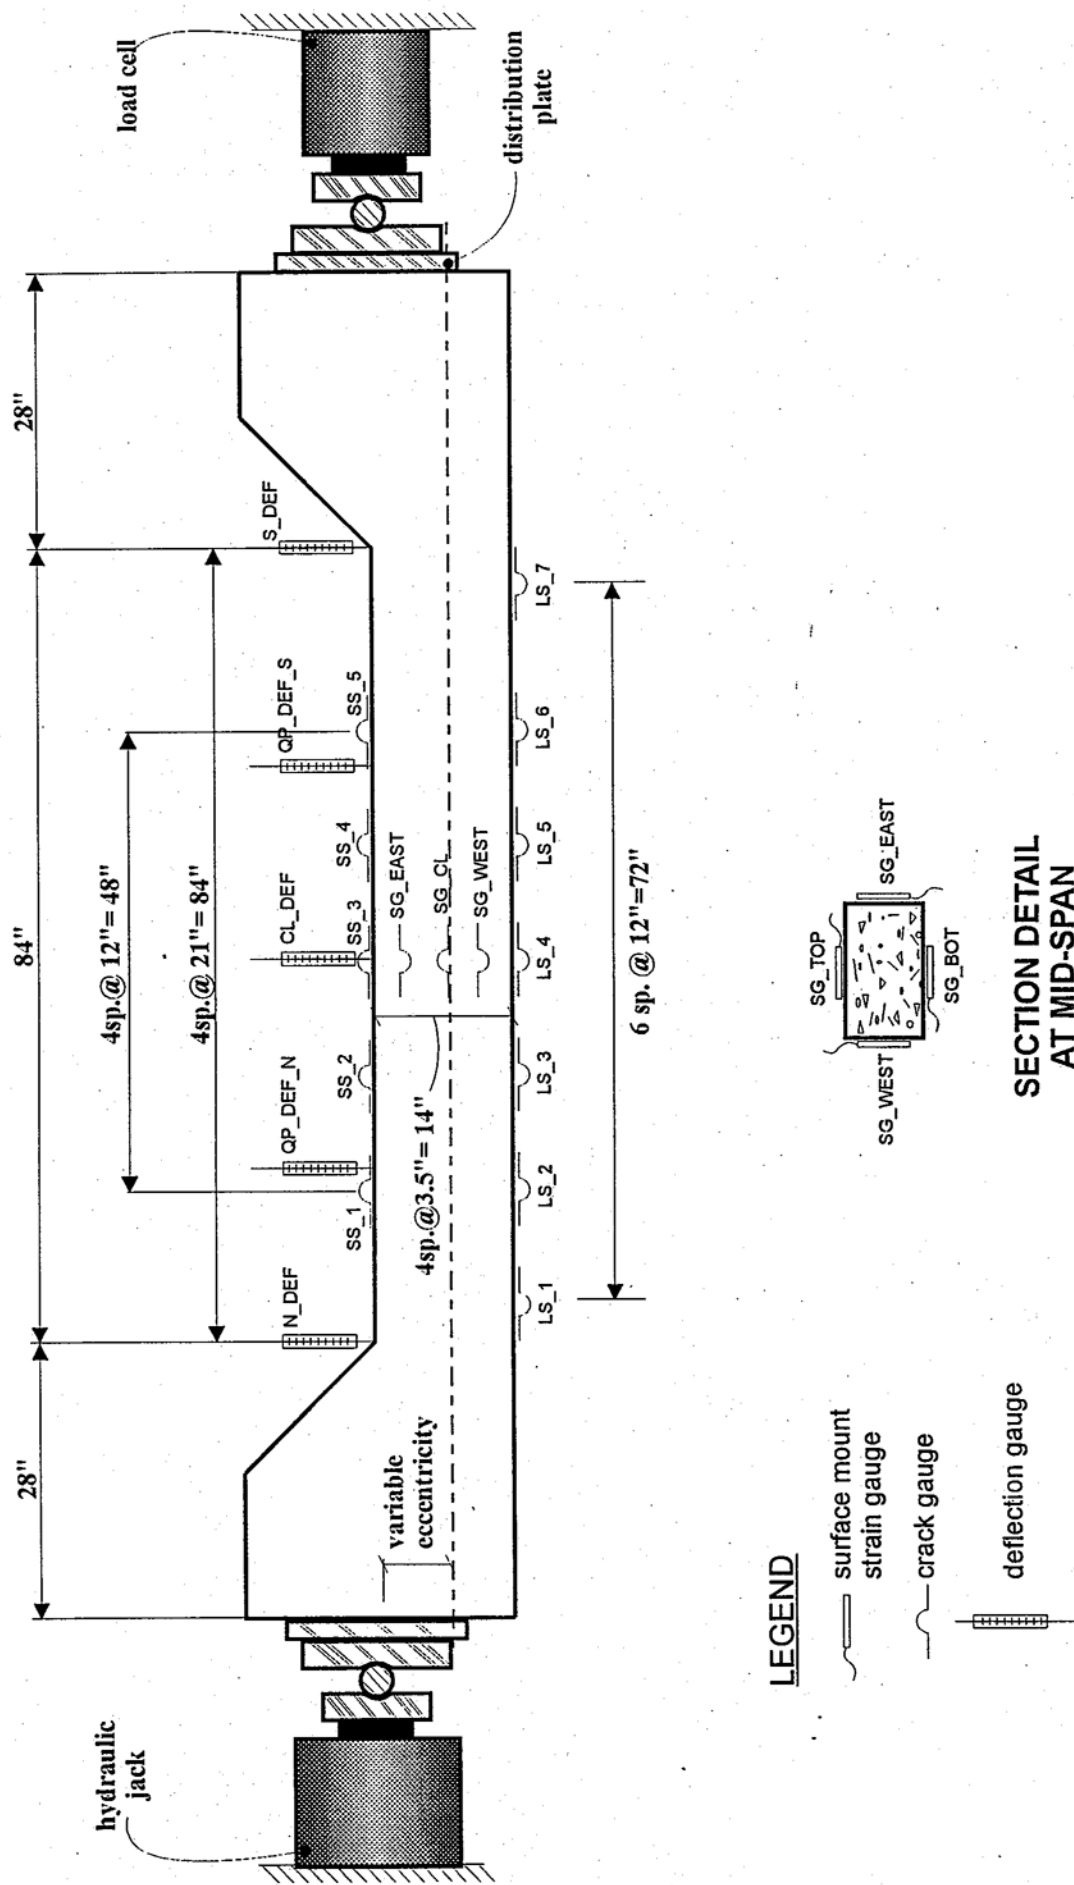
(a) Instrumentation Detail of Specimen With Corbels
